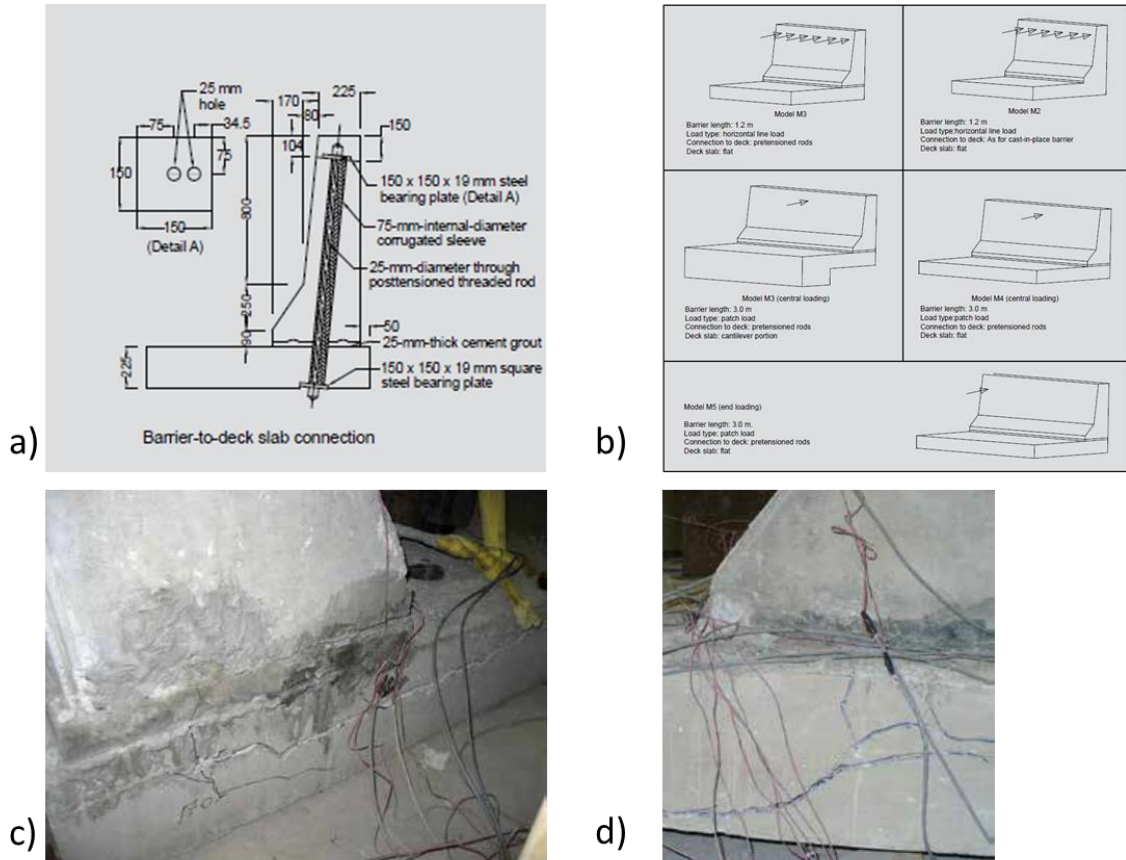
Precast barrier system developed at Ryerson University: a) Details of the connection, b) Testing configurations, c) Crack pattern at ultimate load for model M1, and d) Crack pattern at ultimate load for model M3 [9].
